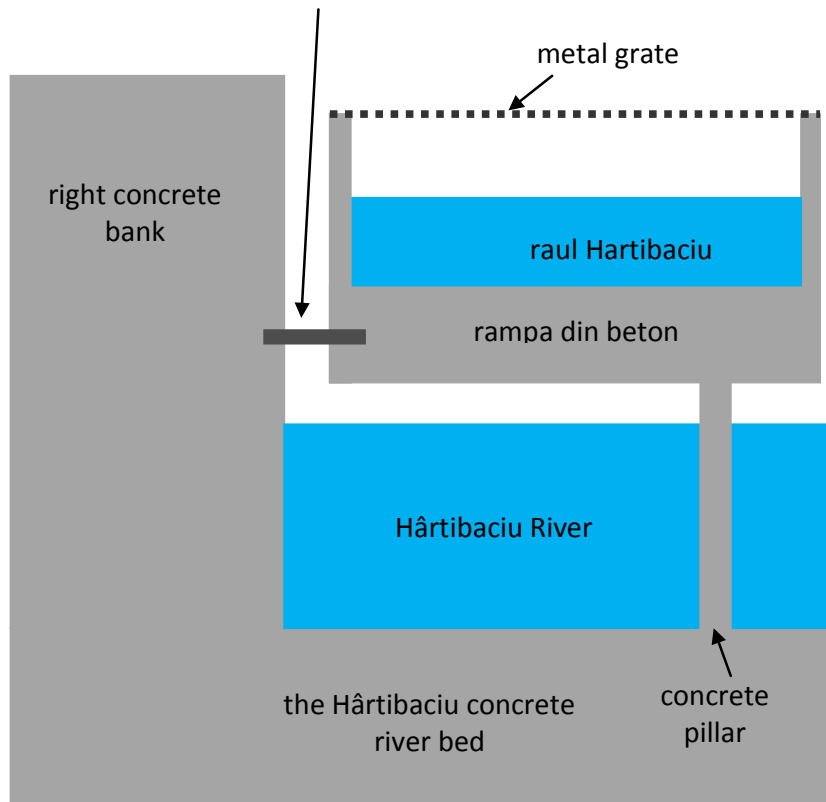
The concrete ramp will be attached to both the concrete right bank and the Hârtibaciu concrete river bed - Indicative scheme
